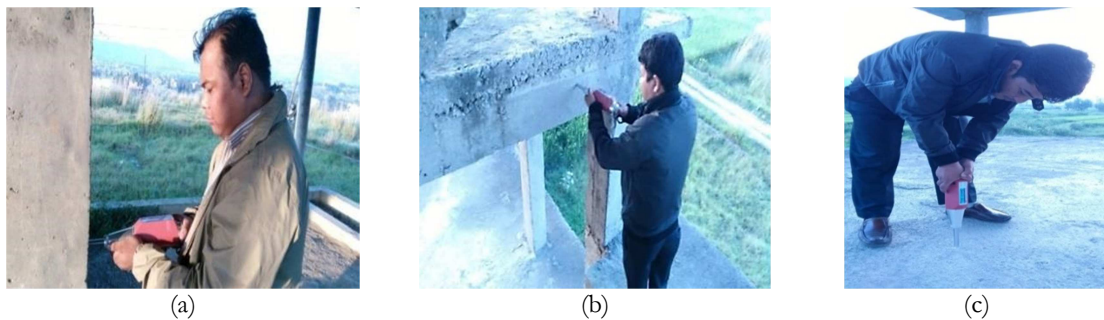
Schmidt hammer test on the structural elements of the bare frame building; (a) Column, (b) Beam, and (c) Slab
